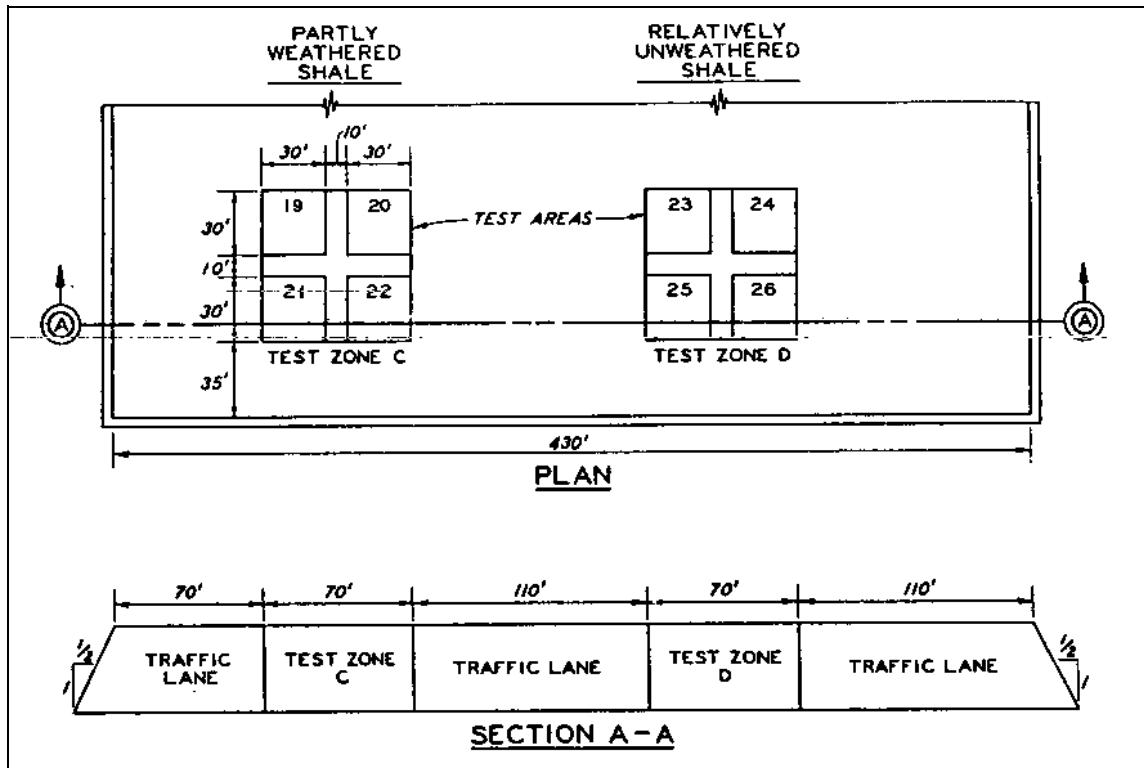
Beltzville Dam, plan and profile of the test fill
